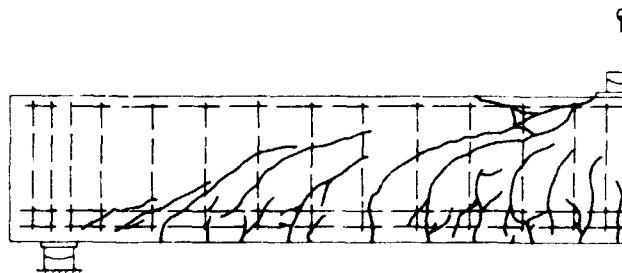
Observed cracking after failure of the A-2 beam.
